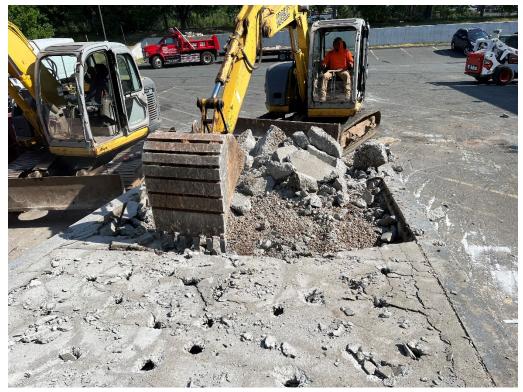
View of pea gravel encountered in the void space beneath the concrete ramp
